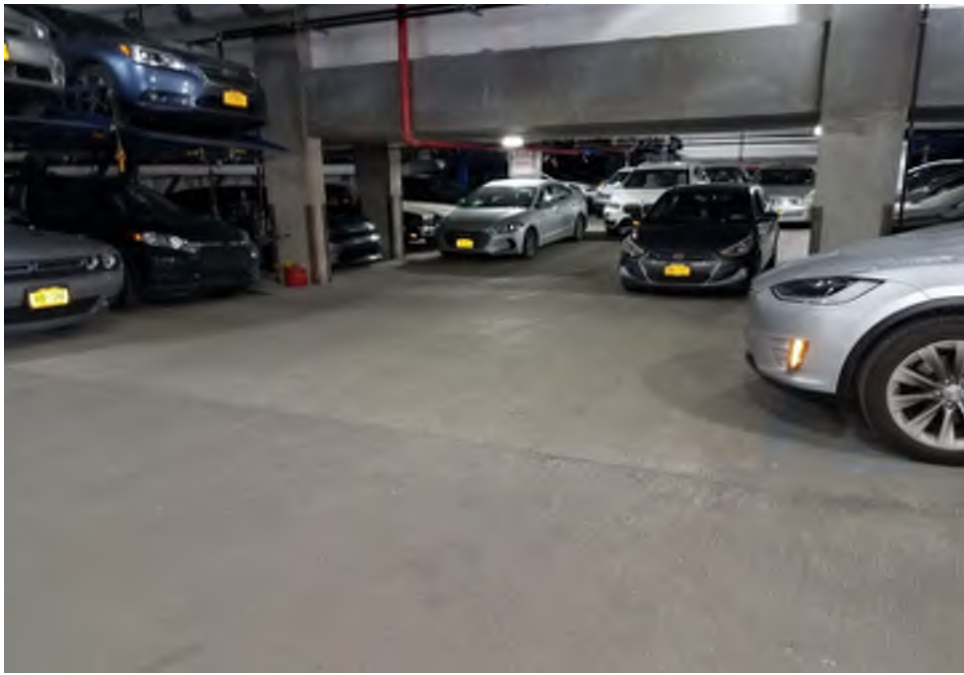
Typical hairline/surficial crack observed in the parking garage, facing north. Cracks did not breach to the subsurface. 27 February 2019.
